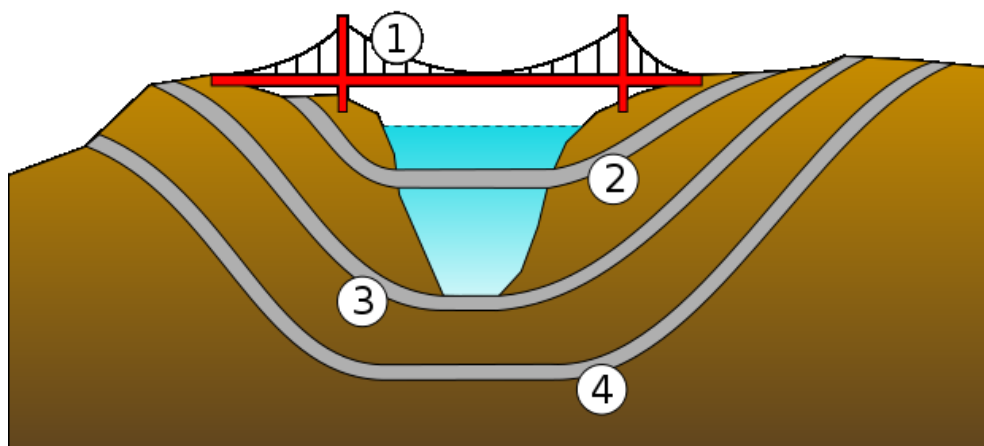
1-Bridge, 2- Submerged tunnel, 3- Immersed tunnel, 4- Driven tunnel [Ref Image 1]
